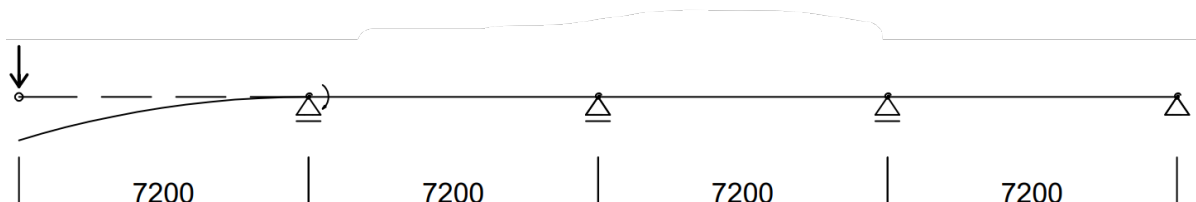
Corner column removed, single span beams supported by semi-rigid connections
